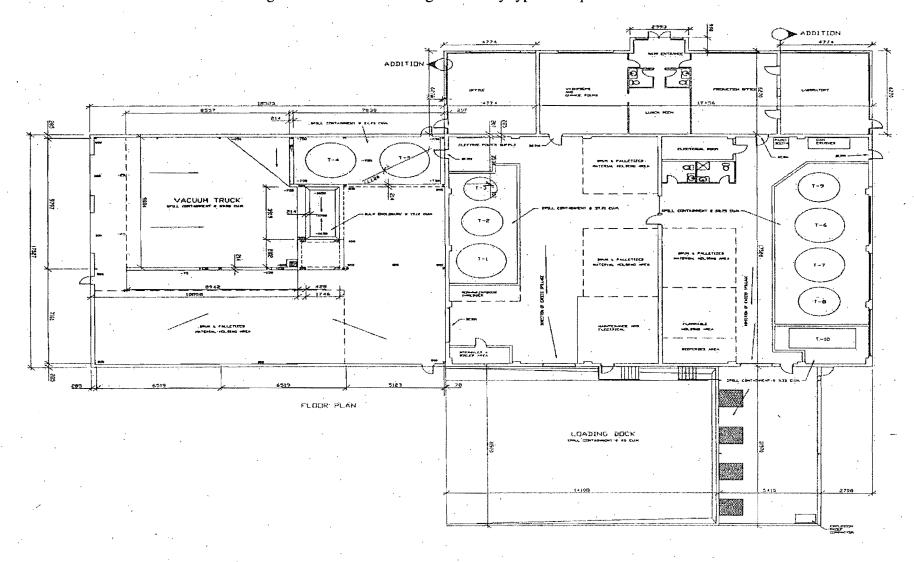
TYPICAL SITE LAYOUT OF WASTE TRANSFER FACILITY
